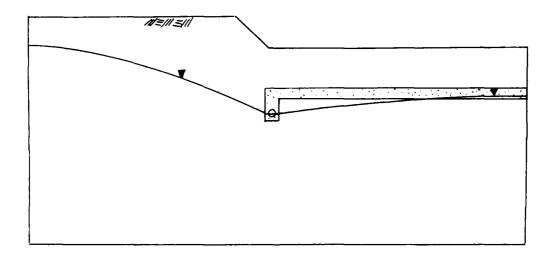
Check case example of a blanket drain with single pipe trench drain.
